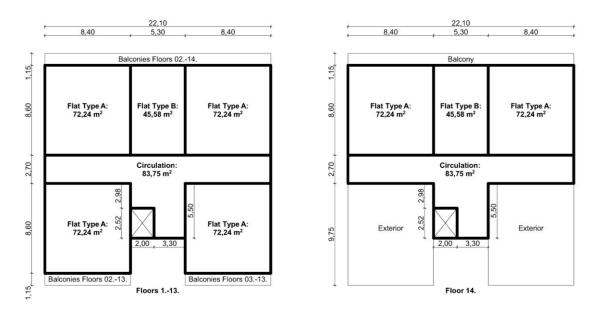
RC benchmark, floor plan, basic setup (illustration by author)
